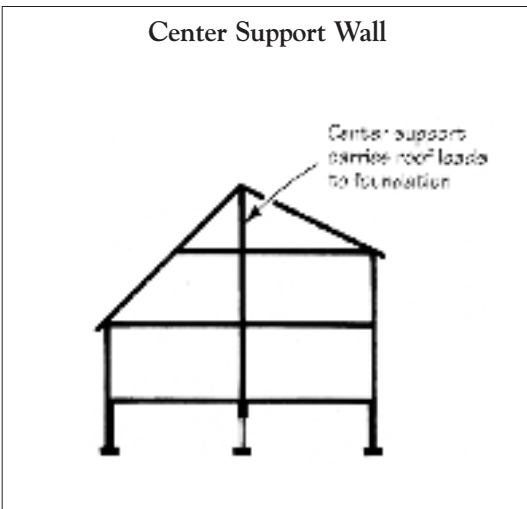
Center support walls are often the easiest way to handle shed dormer loads, but they must provide a continuous path to the foundation.
